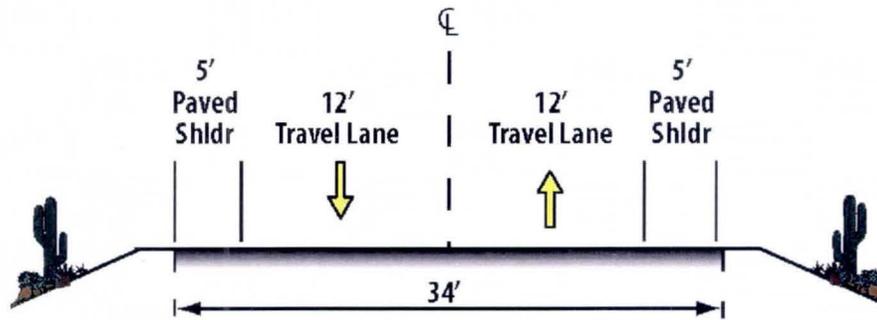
Interim Cross Section: McDowell Boulevard to Lost Dutchman Boulevard
